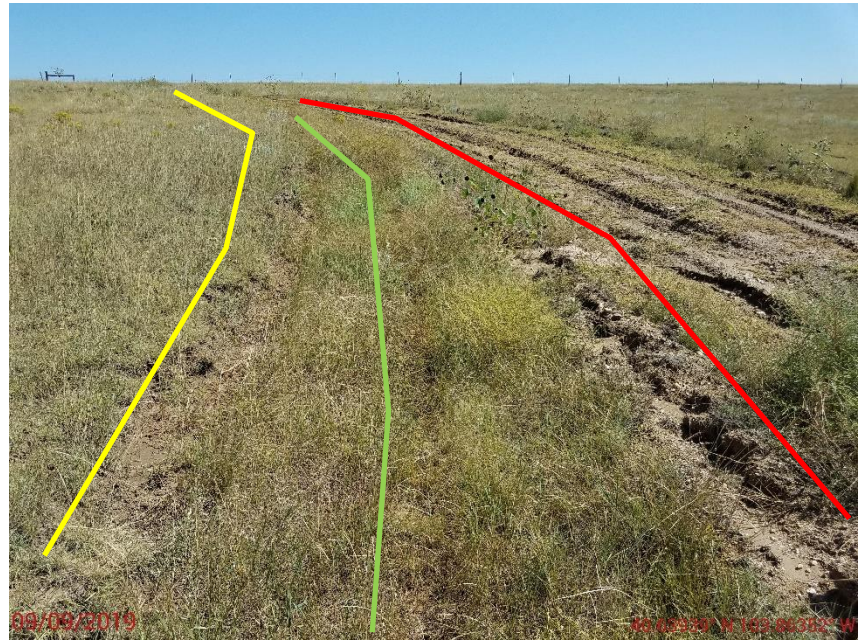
Photo taken from the access road, facing east. Photo shows access road (red) has not been recontoured or graded to that of the adjacent lands (yellow). Ditch (green) evident.
